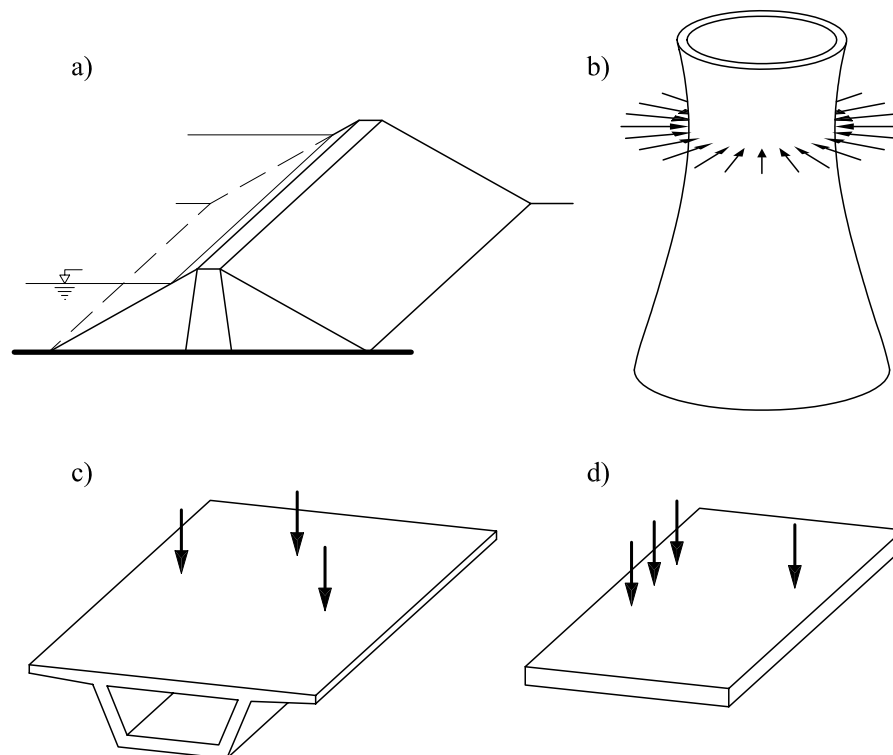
Continuous structures: a) Dam, b) Shell, c) Bridge, d) Plate
